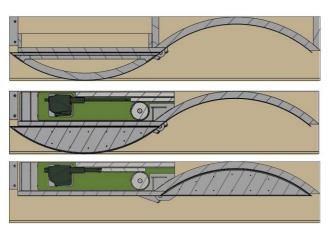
Schematic horizontal cross section and top view of variable absorptive elements along the high side walls with rotating panels in open and closed in condition.
